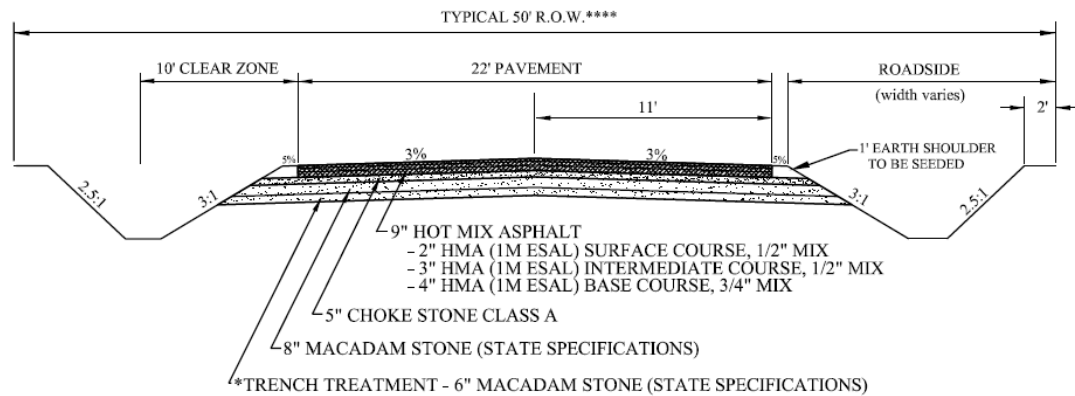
CONSERVATION SUBDIVISION: TYPICAL MINIMUM H.M.A. PAVEMENT - OPEN DITCH SECTION
